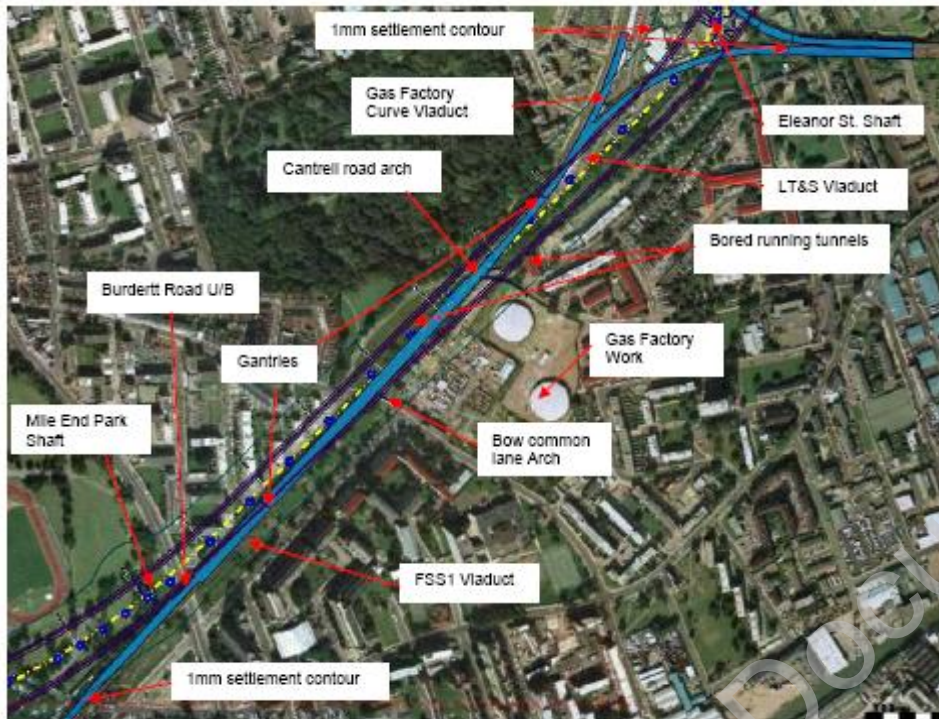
Location plan for interface between Crossrail running tunnels and Network Rail FSS1 Gas Factory Curve Viaduct – NR19
